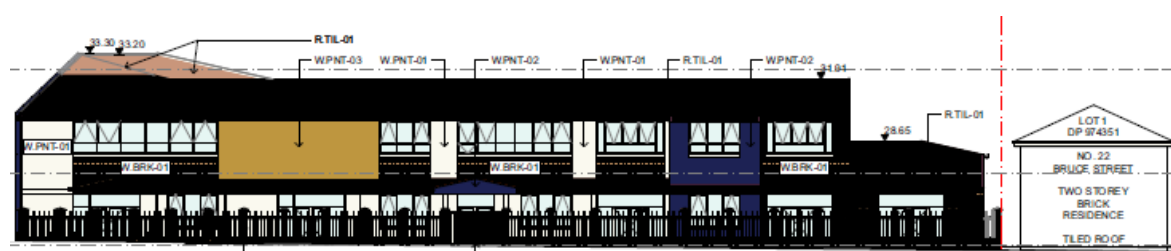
Eastern elevation of proposed development along Bruce Street. Adjoining to the right is No. 22 Bruce Street a two storey dwelling.
